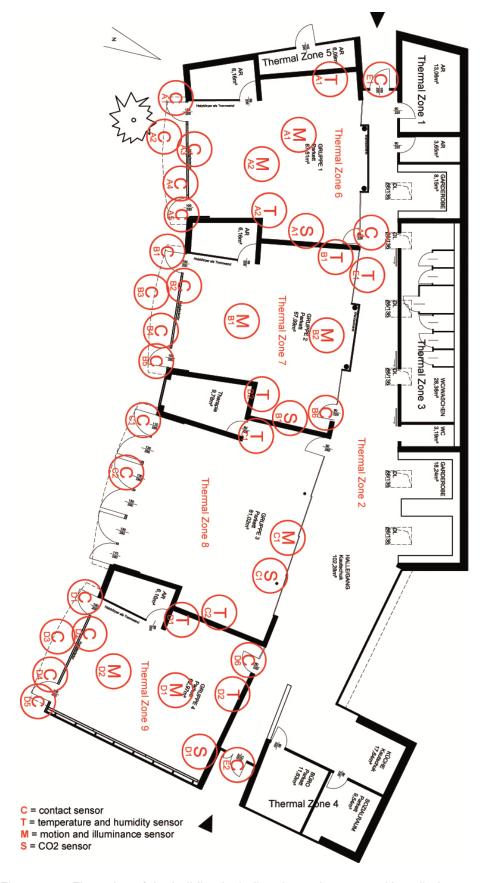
Floor plan of the building including thermal zones and installed sensors
